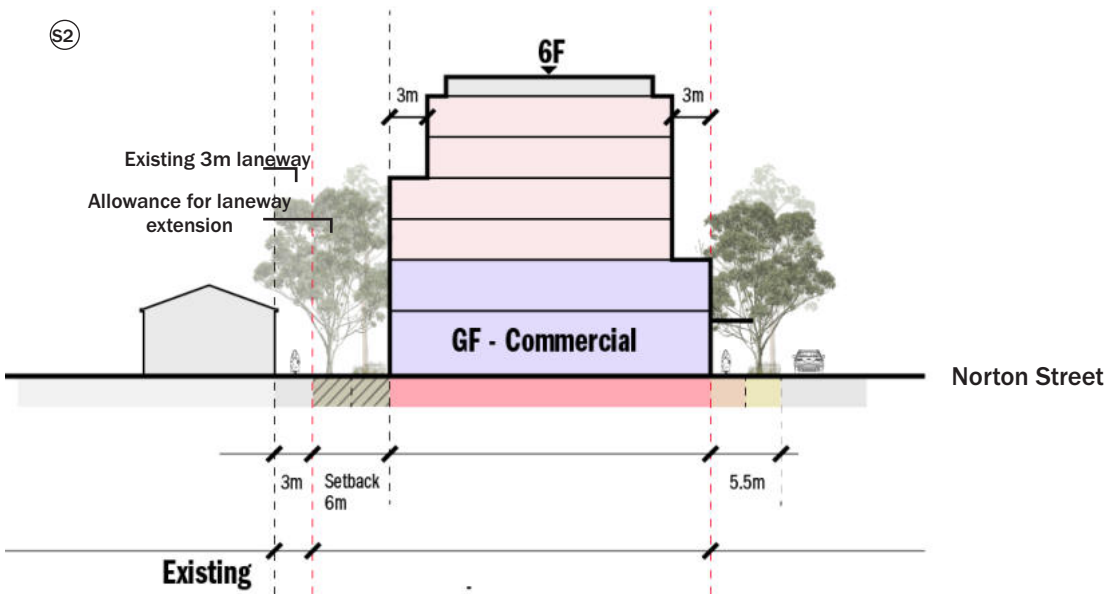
Section 2 - side cross section of a six storey mixed use development on Norton Street with an existing lot and laneway at the rear
